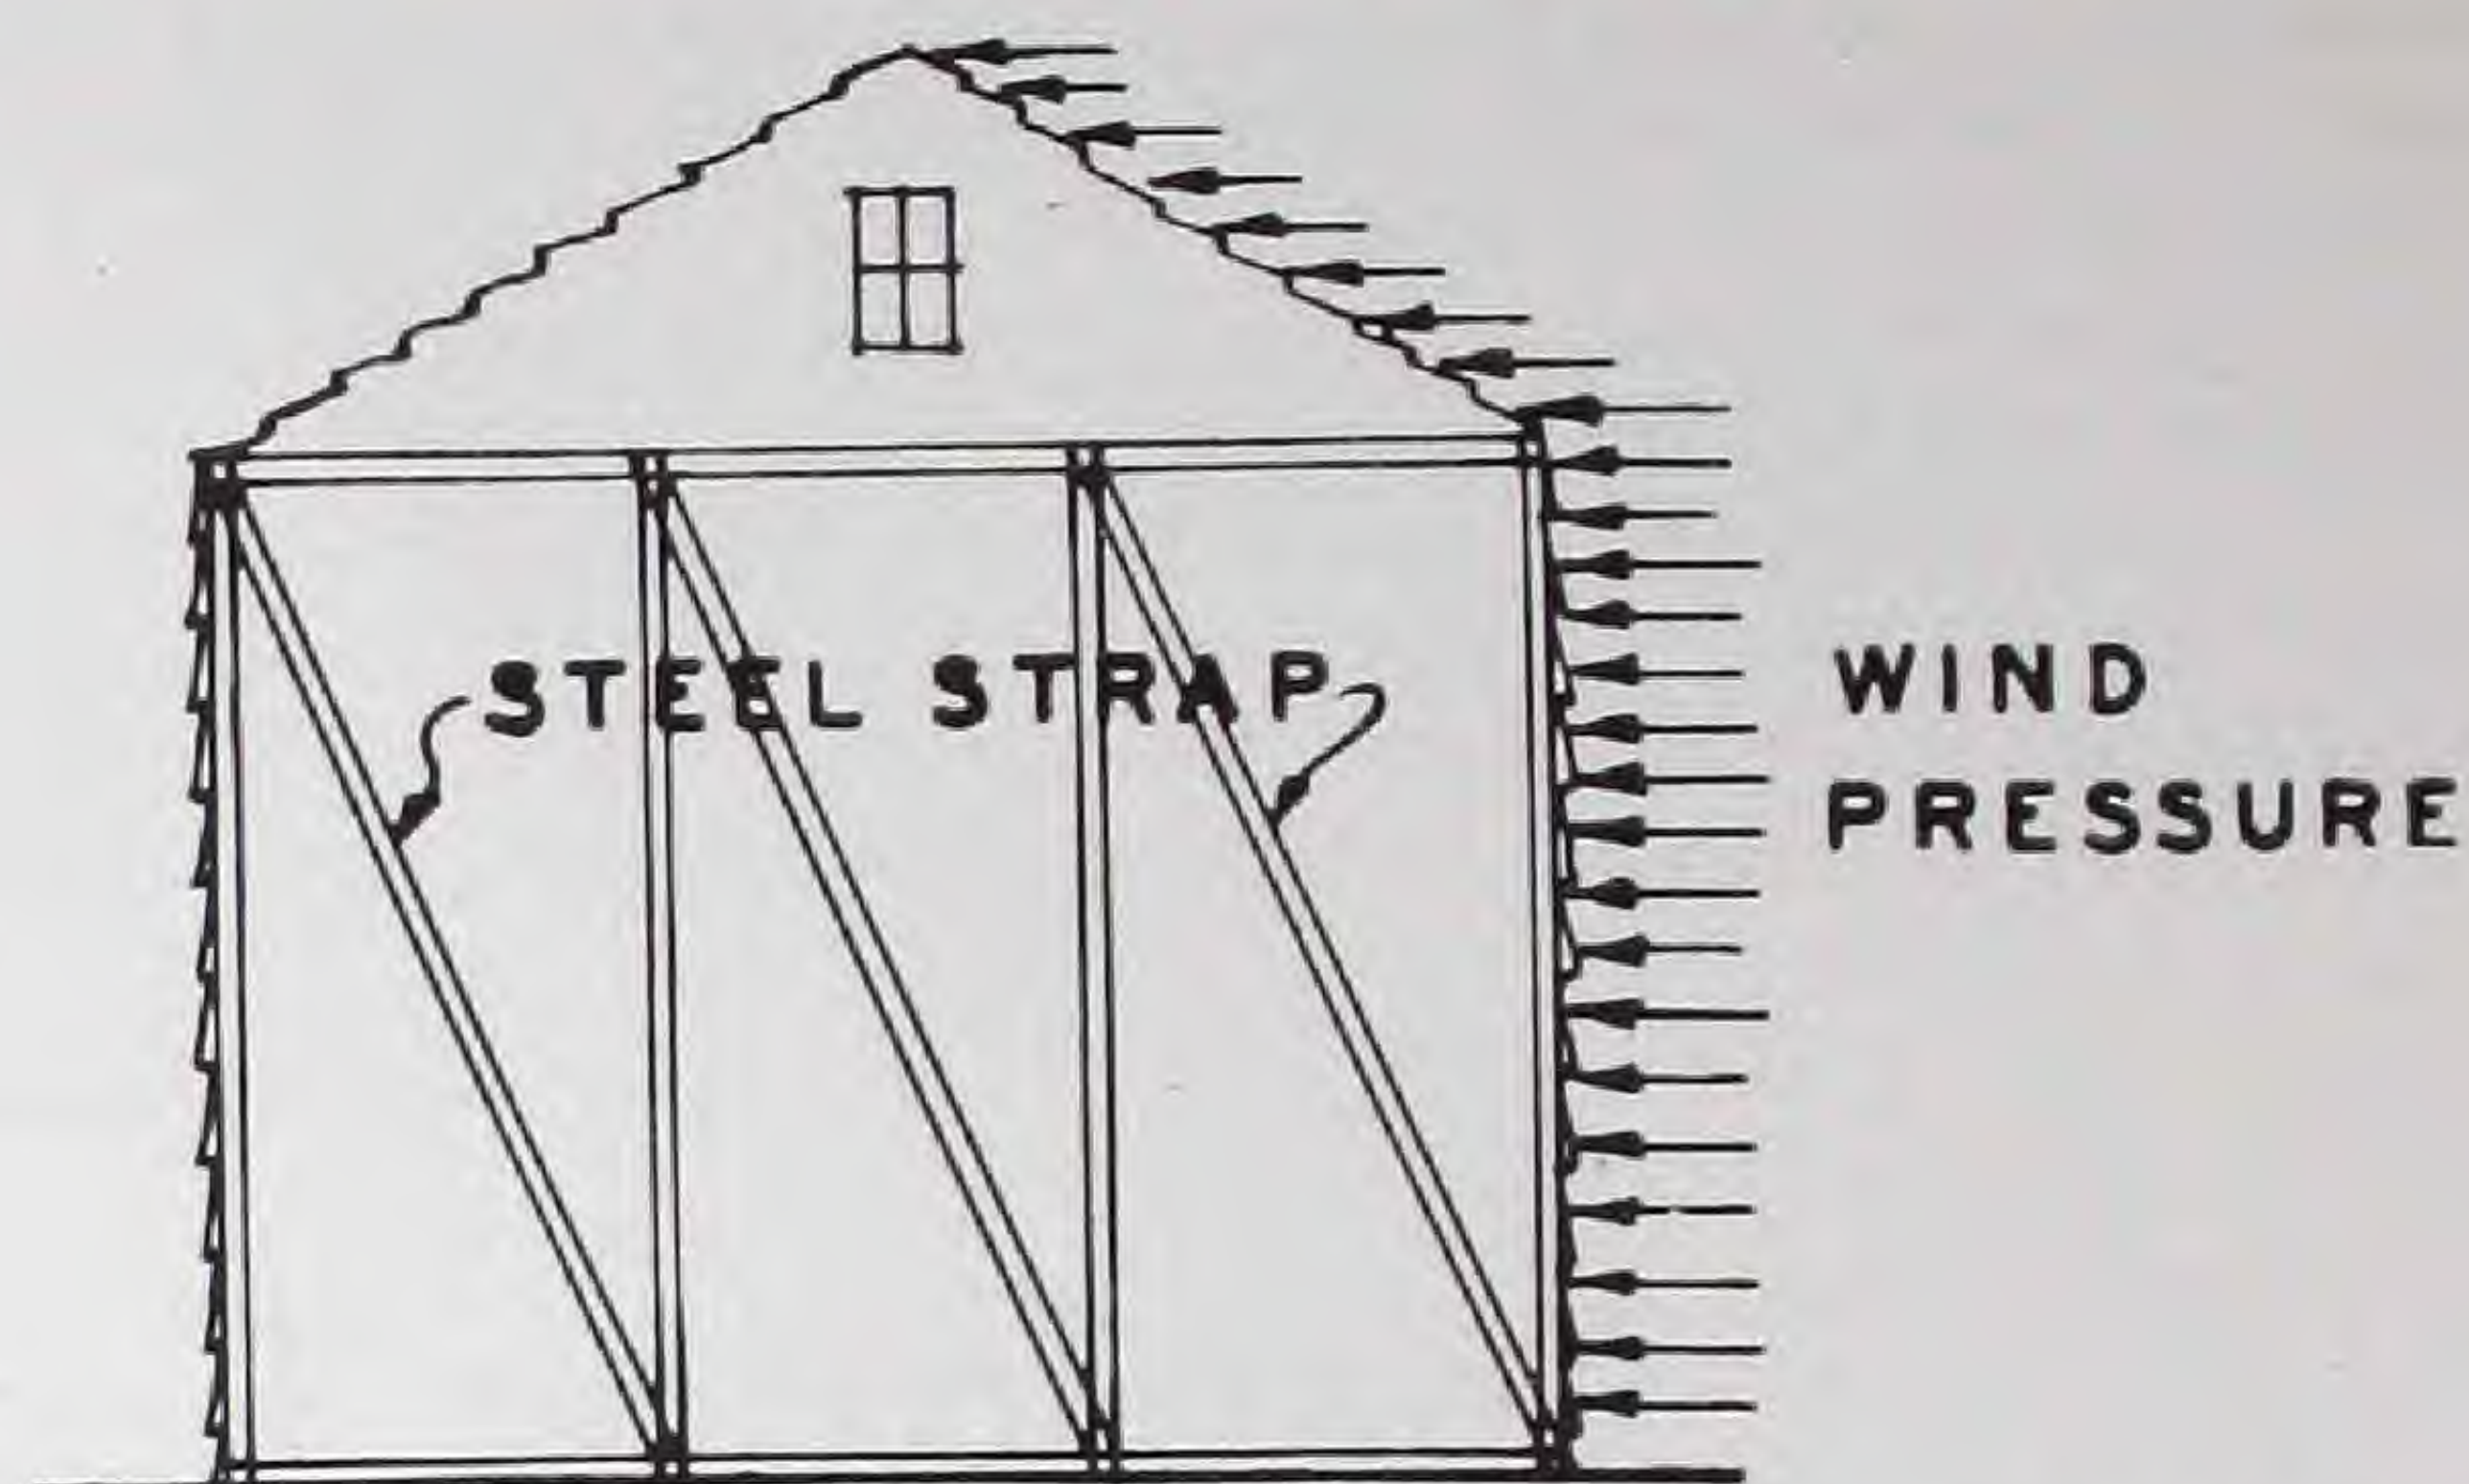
Sheathing removed from end; diagonal steel bracing straps under tension; building not distorted.
